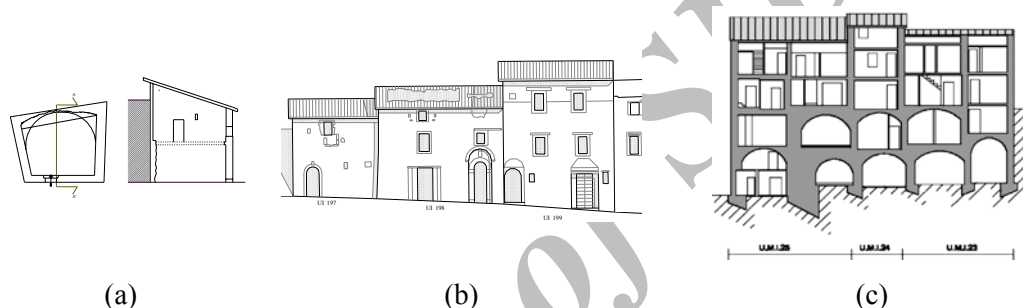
Example of: a) simple isolated building; b) row building; c) complex building
